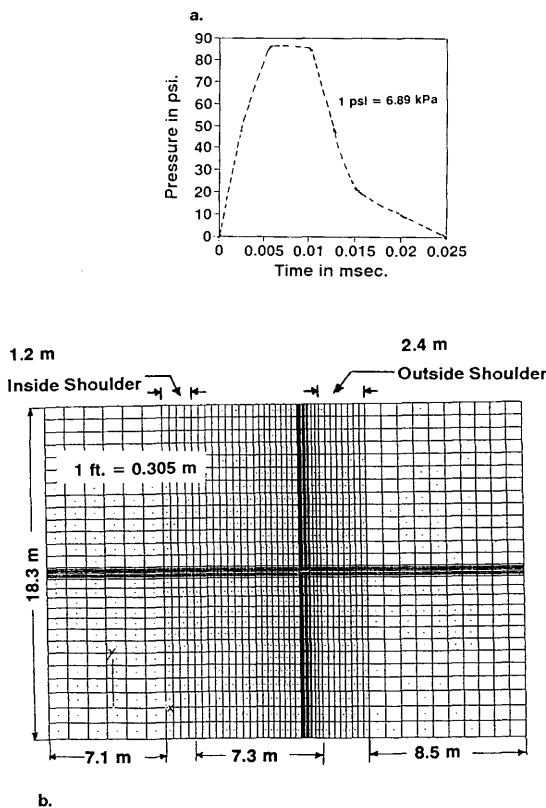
Finite element pavement subgrade model configuration for pavement crack study (a) FWD load pulse, (b) plan view of three-dimensional finite element model.
